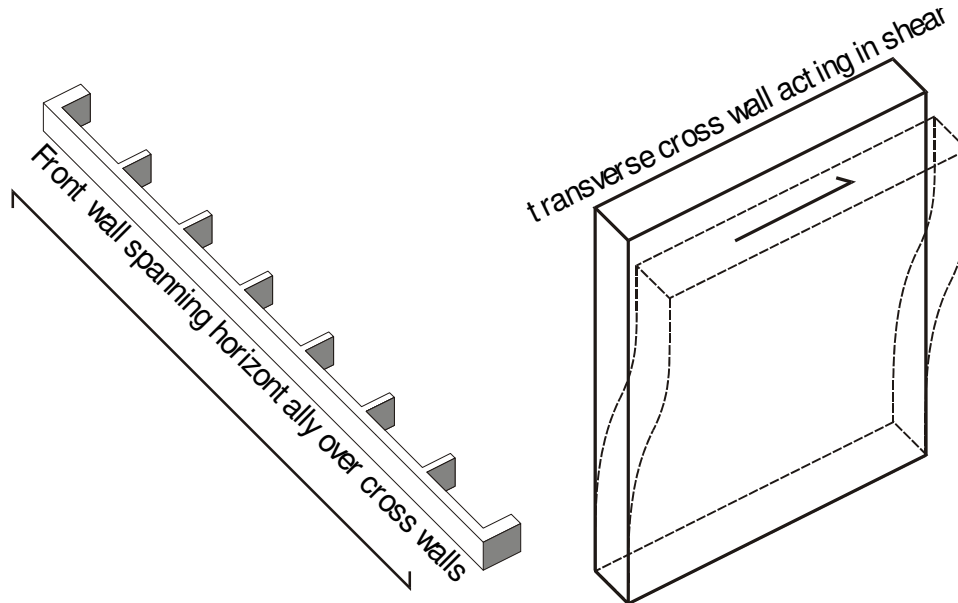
Isometric view of Front Wall (1m strip) and a Cross Wall Panel.
